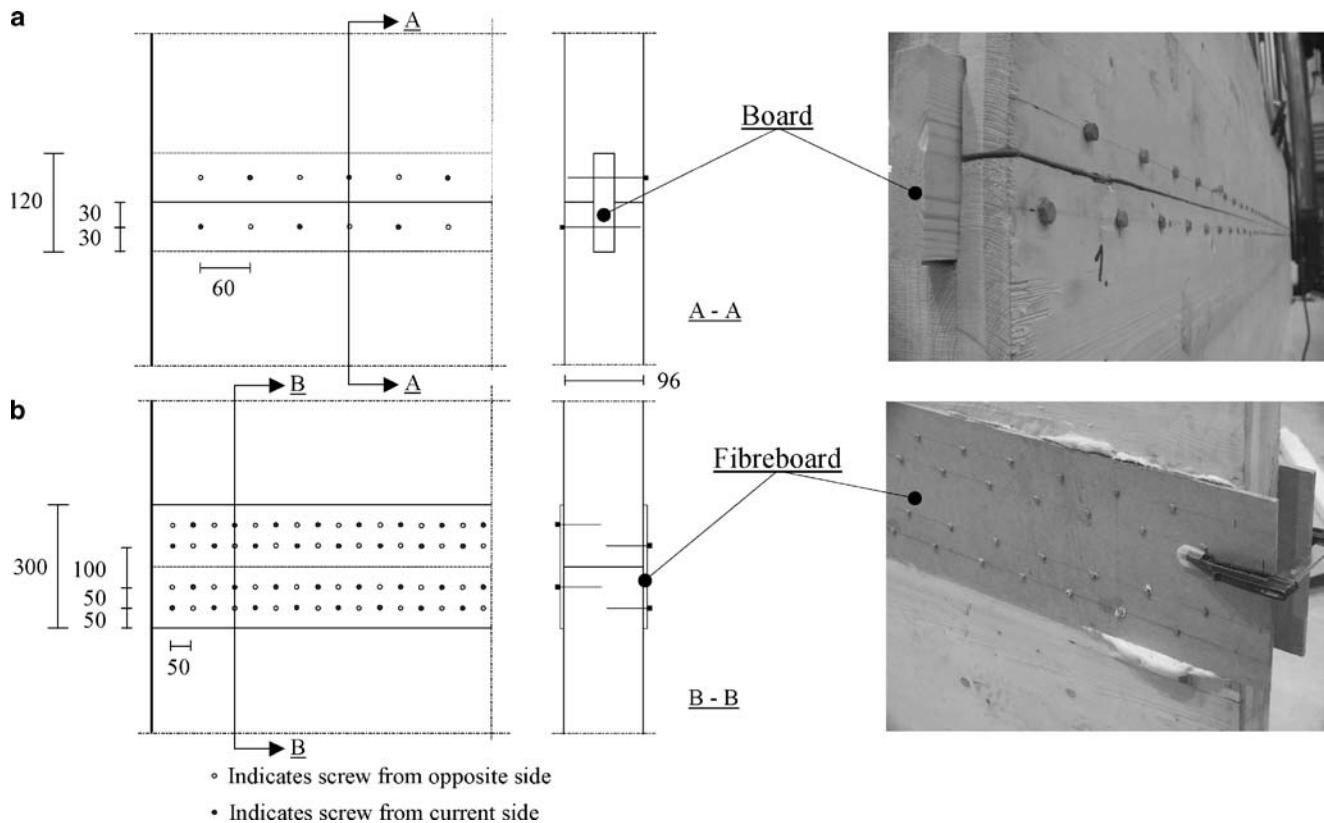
Joints of the longitudinal wall-elements: (a) element 5 with a sawn board screwed to the parts of the element and (b) element 6 with fibreboard sheets glued and screwed to the parts of the element
